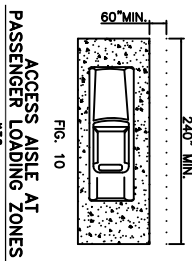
ACCESS AISLE AT PASSENGER LOADING ZONES
